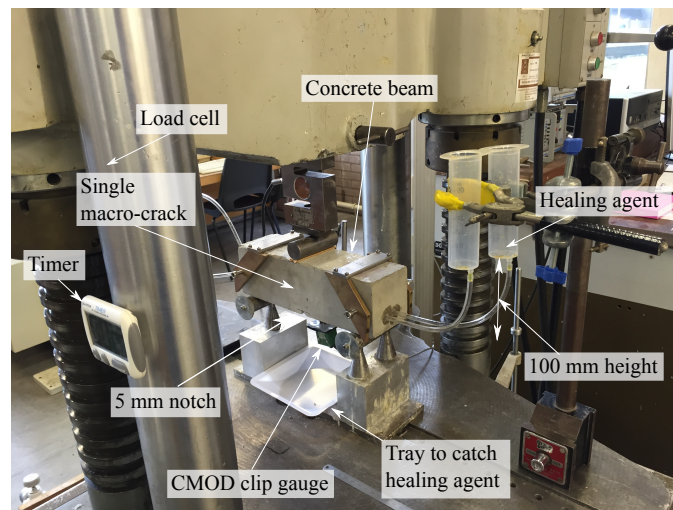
Test setup for three-point bending characterisation of pattern on fracture surface test
